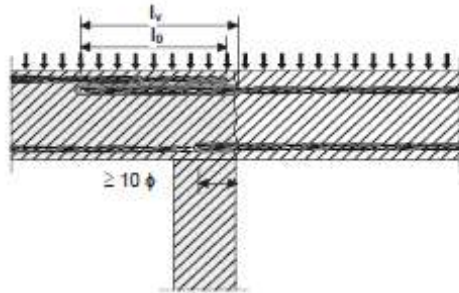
Overlap joint for rebar connections of slabs and beams
